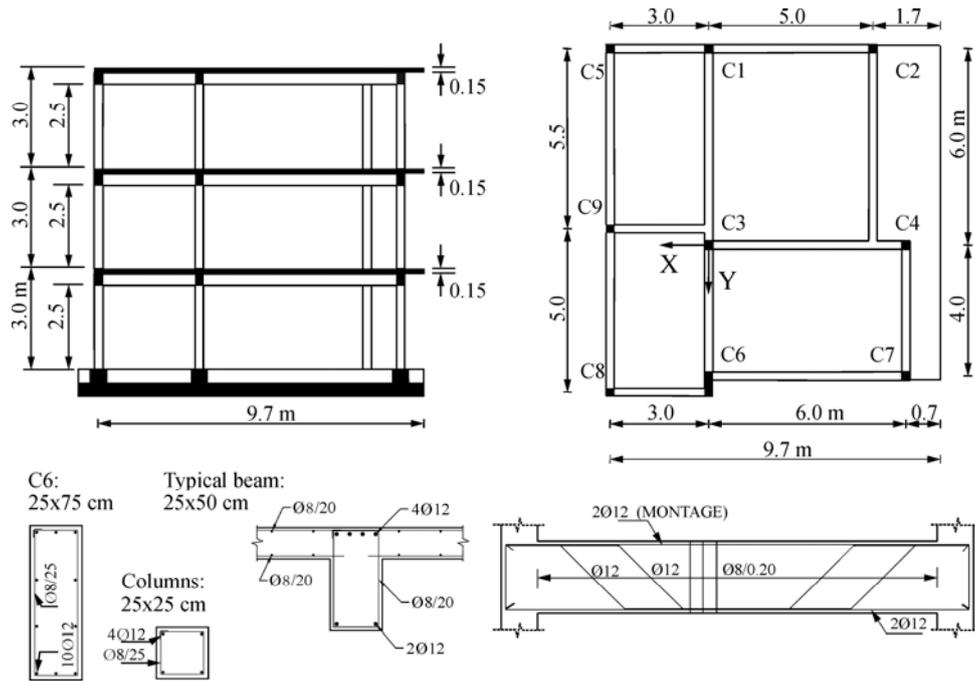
The elevation and the plan view of the SPEAR building, showing typical reinforcement details.
